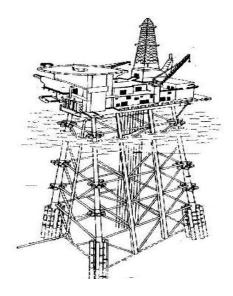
Fixed steel jacket platform (zribi, lautairi et al. November 2003)
